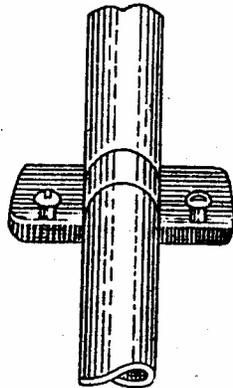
INSTALLATION OF CONDUIT WITH SPACING SADDLE
